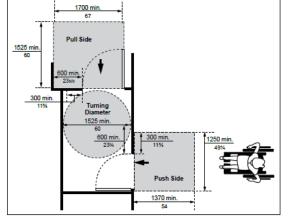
Doors in Series Where Doors are not Aligned - Plan View
